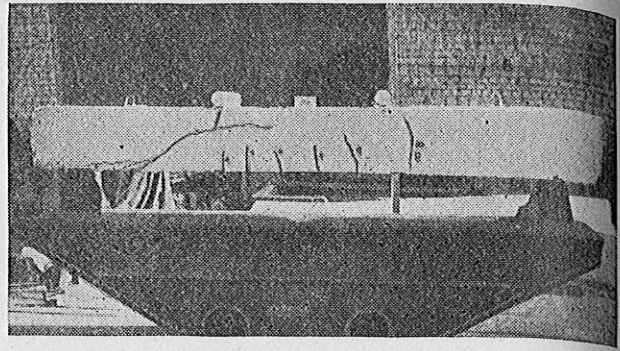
Showing shear failure of a lightweight concrete beam
